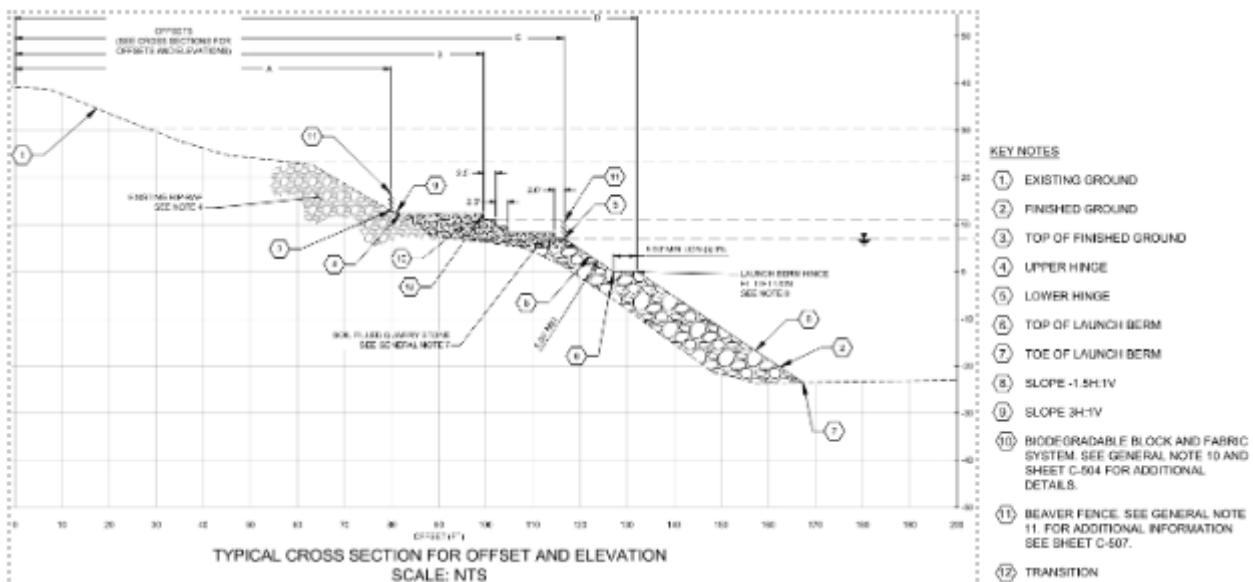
Bank Protection Designs. Example cross section showing approximate depth and thickness of rock revetment and launchable toe below 7 feet elevation (WSE). Above 7 feet,
